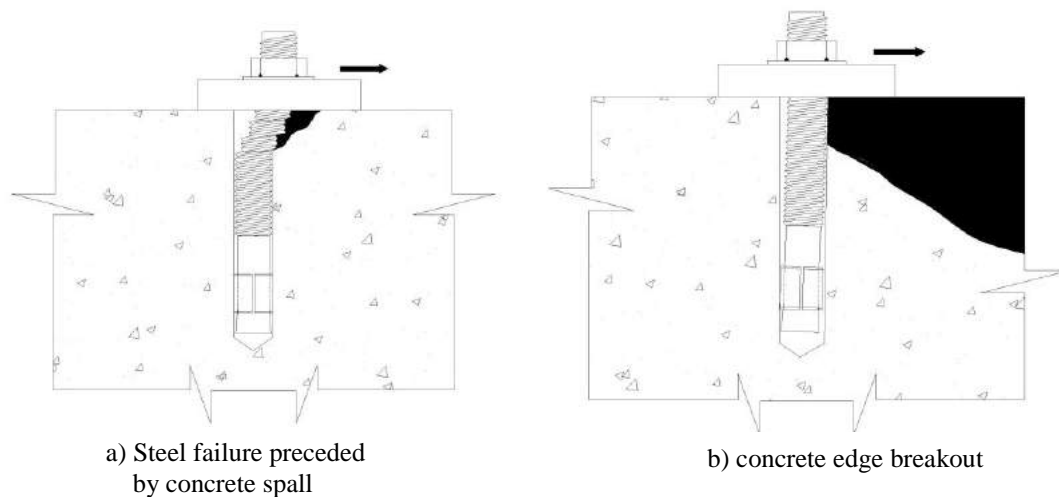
Failure modes of expansion anchors under shear loading (after ACI 355.2-01).
